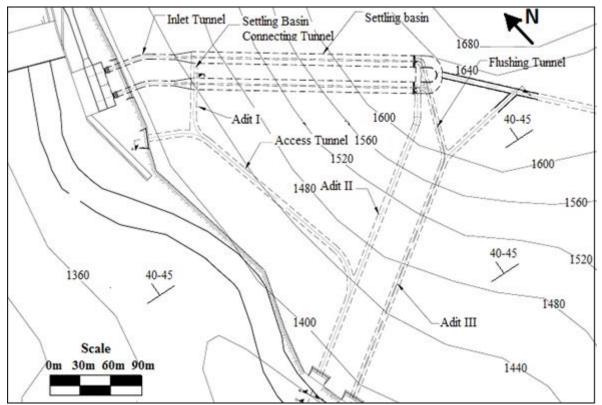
Existing layout plan of settling basin caverns; Alternative I (HH 2009)
